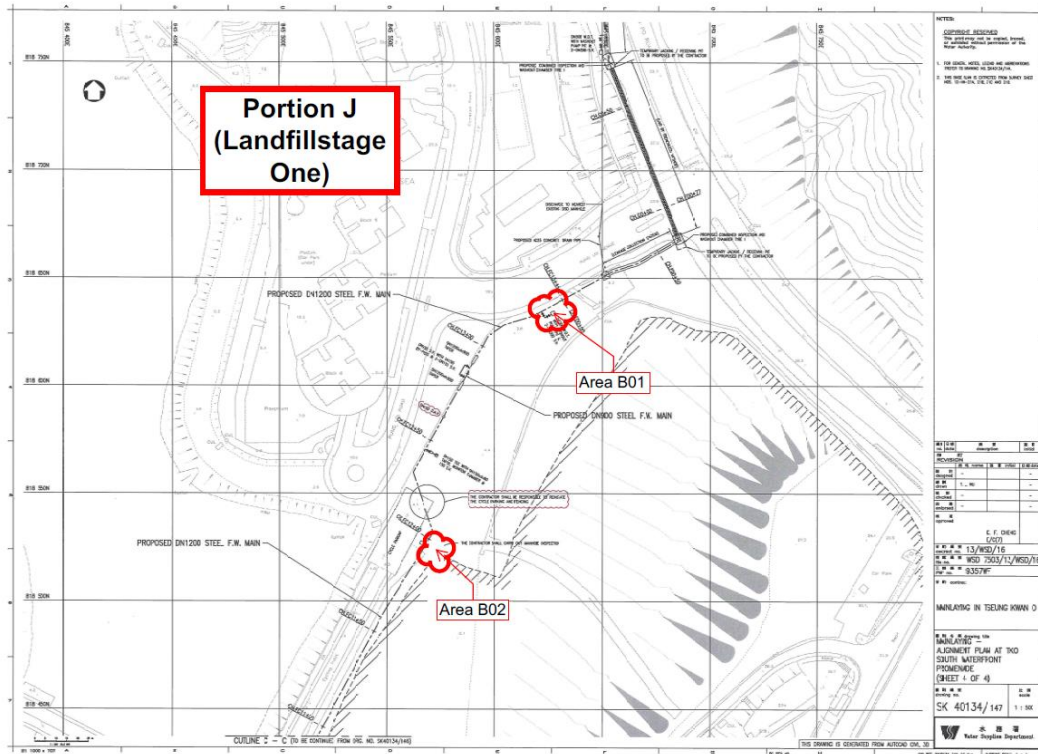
Location Plan – Landfill Stage 1 (Area B01-B02)
